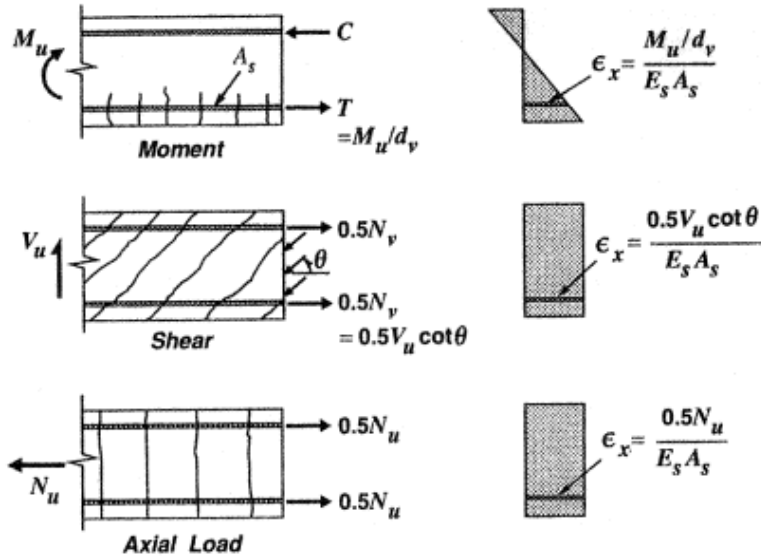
1-Determination of strains, ϵ_x , for non prestressed beam
